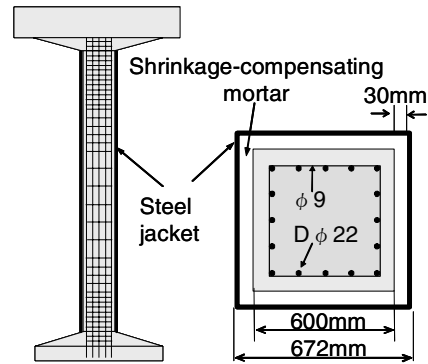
Arrangement of reinforcing bars and cross section of the jacketed column
